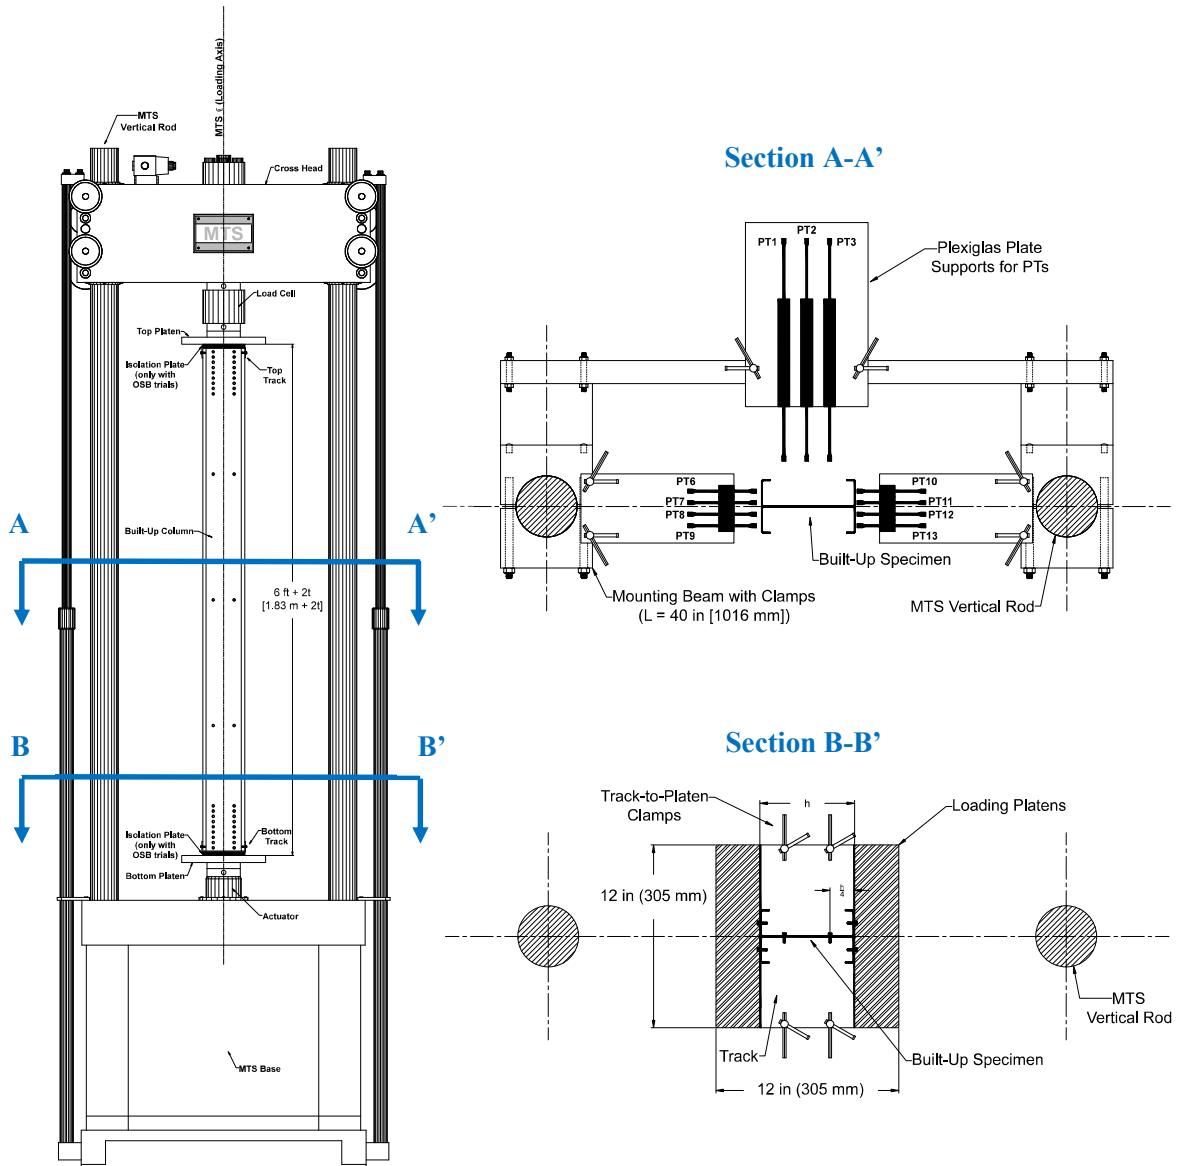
MTS testing rig with specimen installed (left), position transducer arrangement at mid-height (Section A-A'), and specimen positioning on loading platens (Section B-B').
